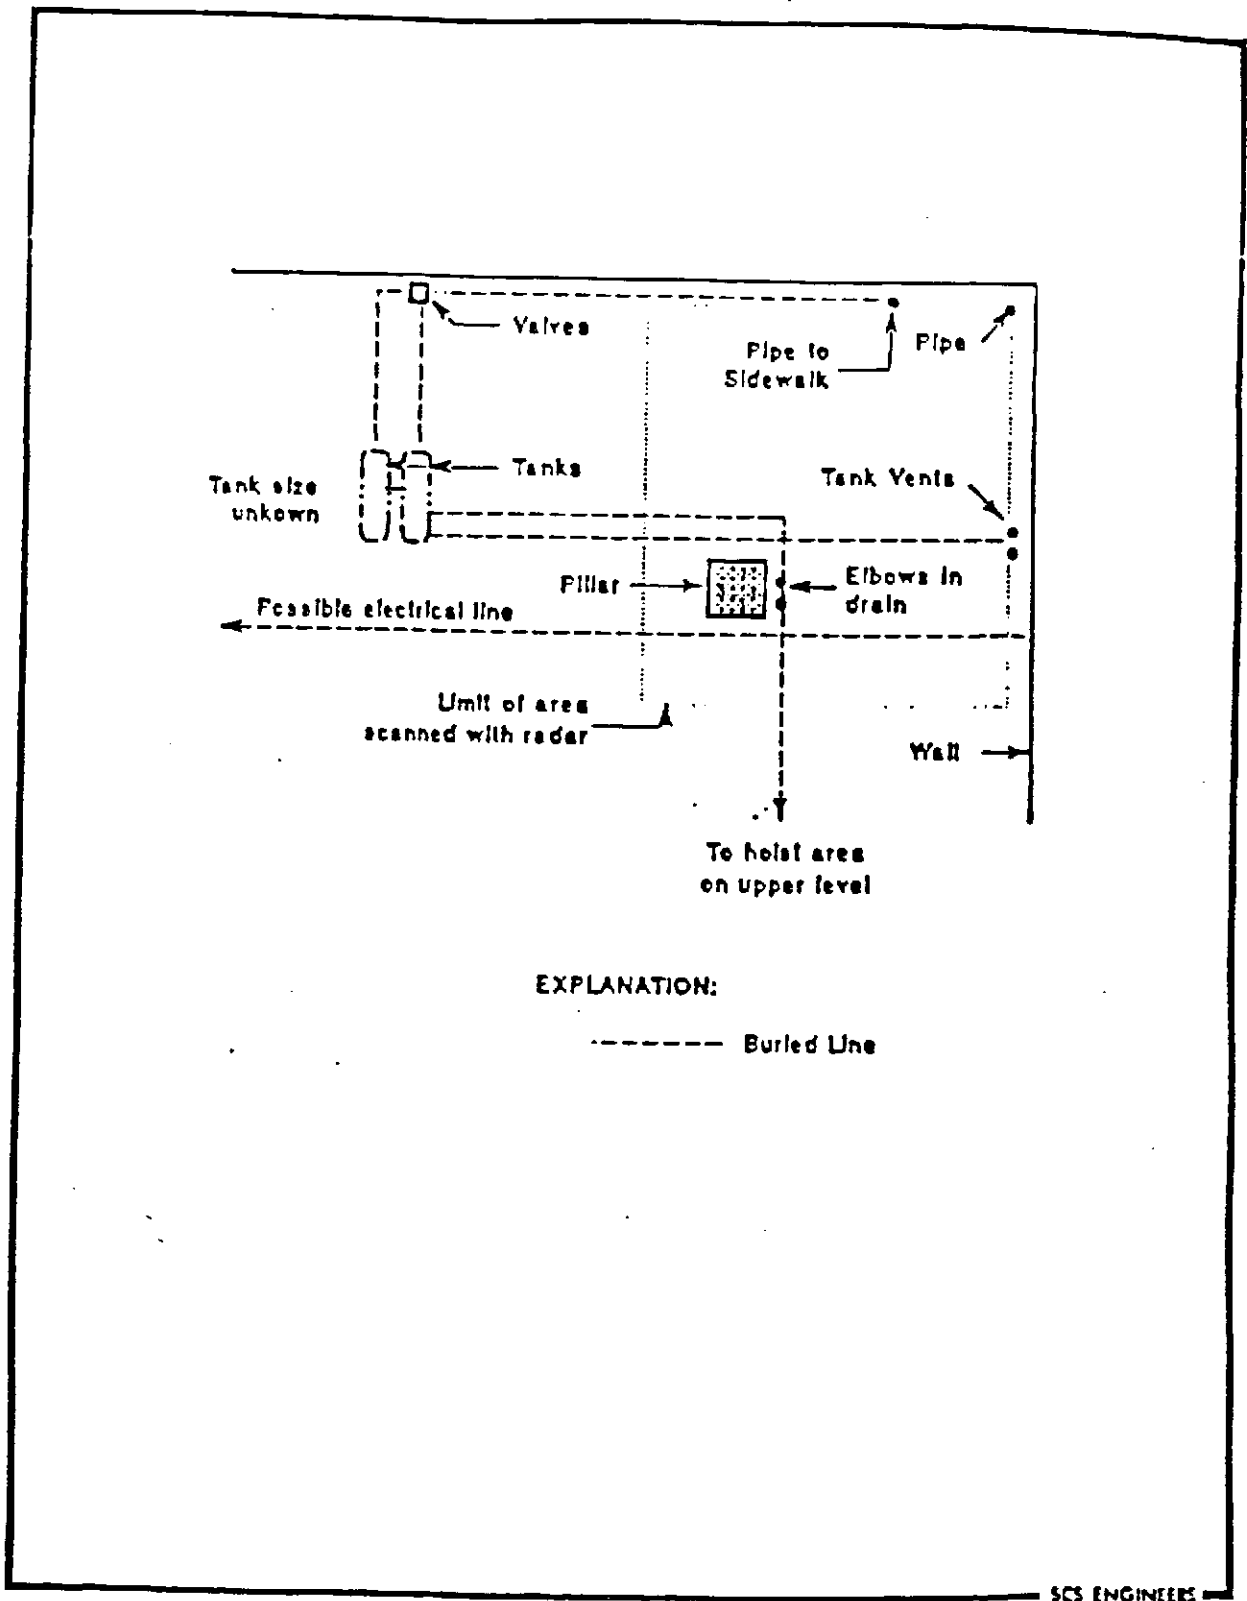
Detailed Site Plan of Alice Street Basement Garage, Showing Tank and Associated Piping Locations based on Geophysical Survey
